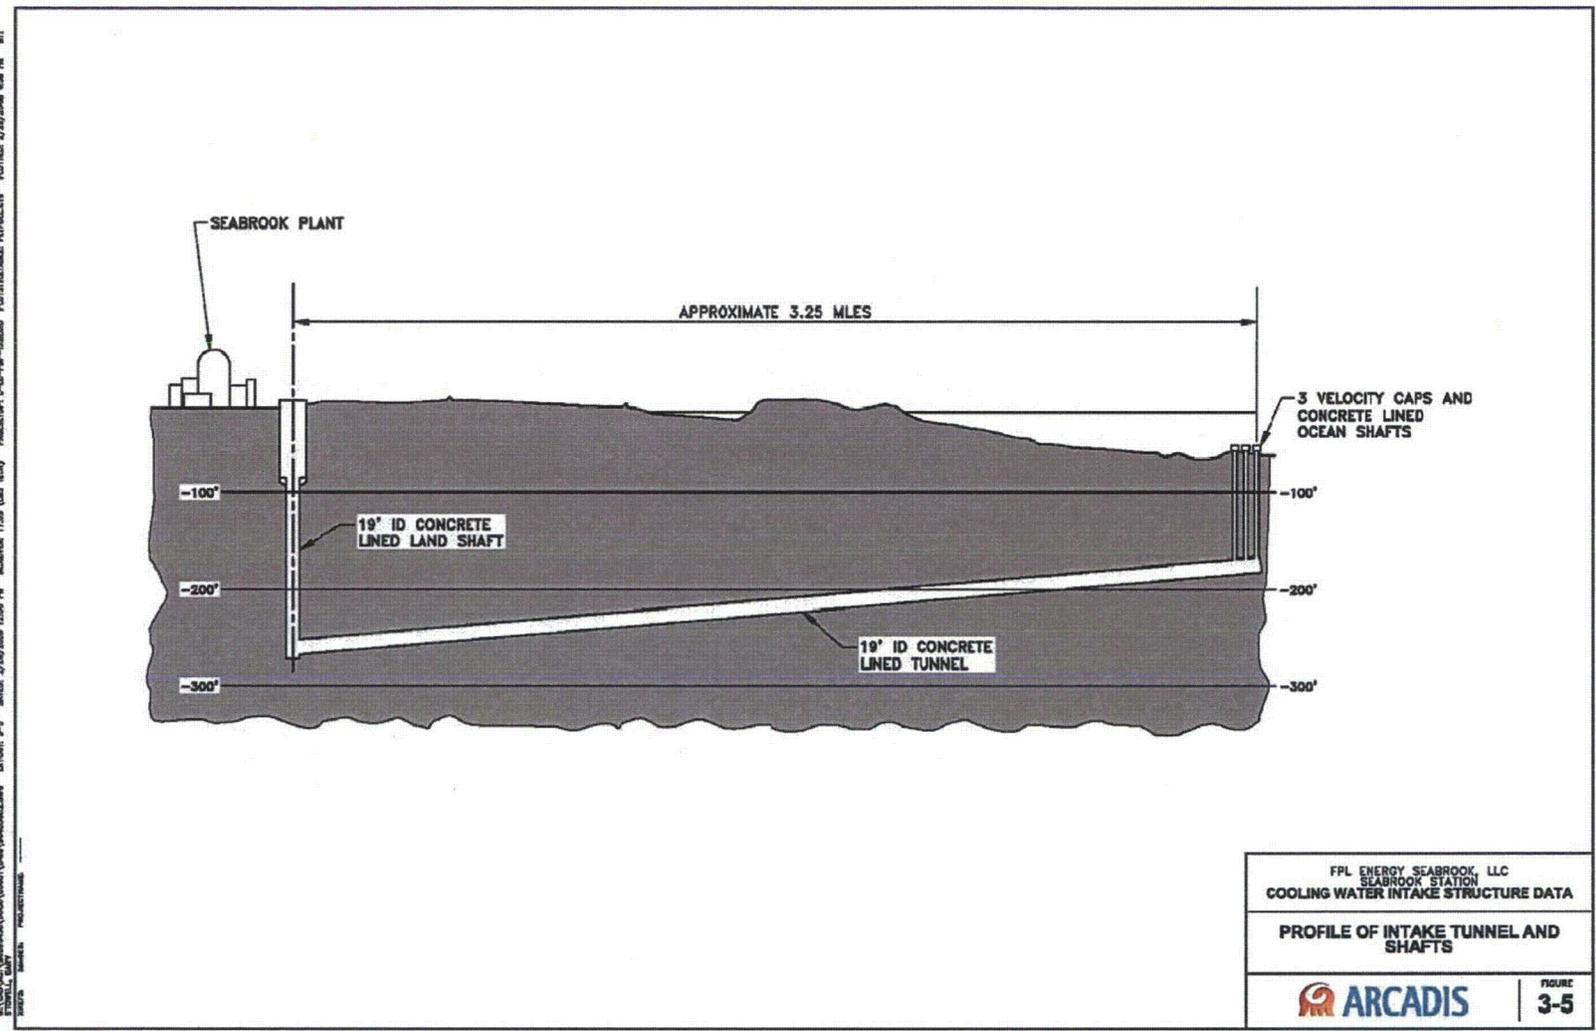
Profile of Intake Tunnel and Shafts at Seabrook Station.
